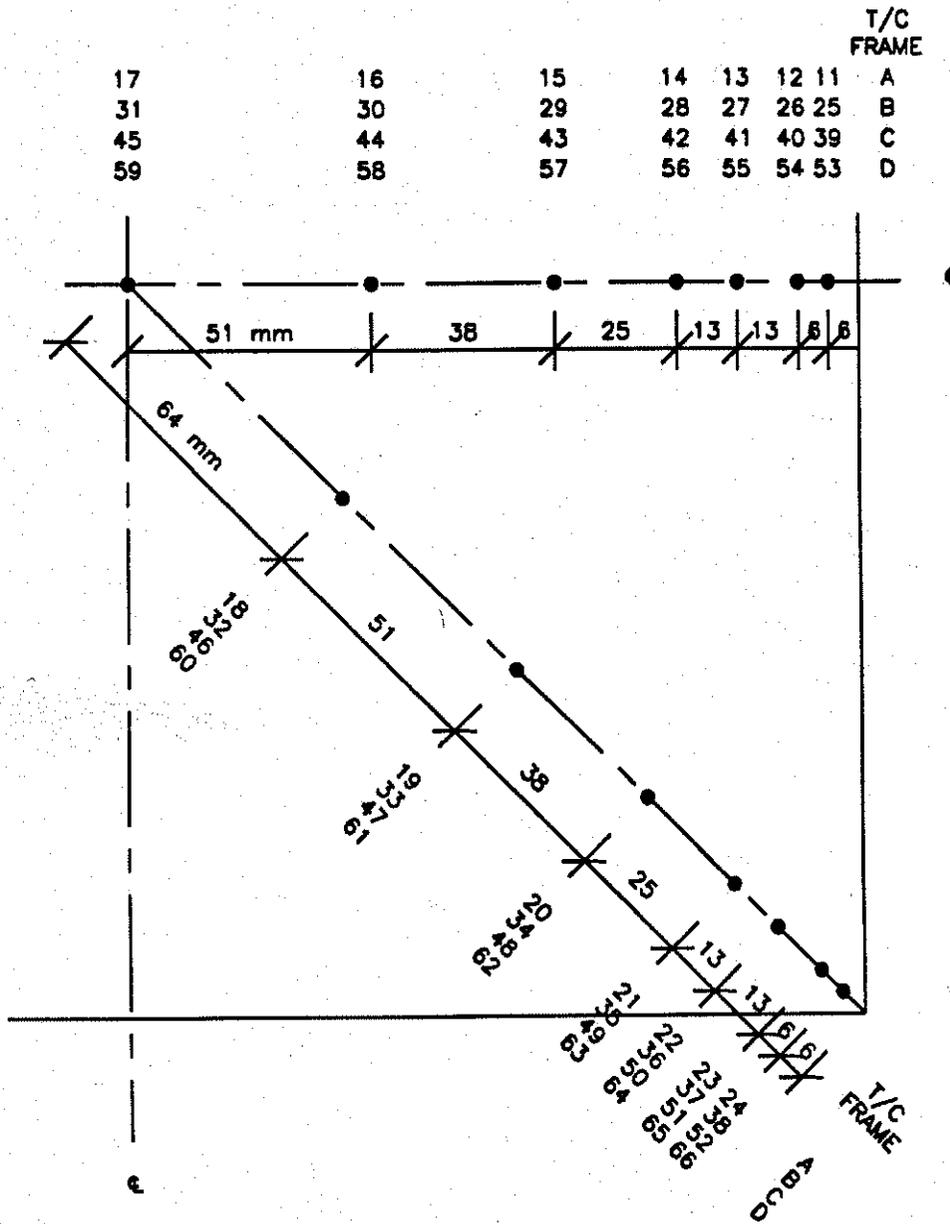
LOCATIONS OF T/C'S IN FRAMES: COLUMN NO. 1
